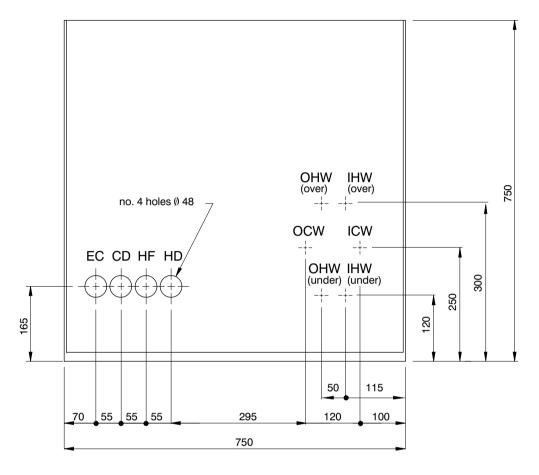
q Water and electrical connections Liebert HPM S08-11C - Plan view
